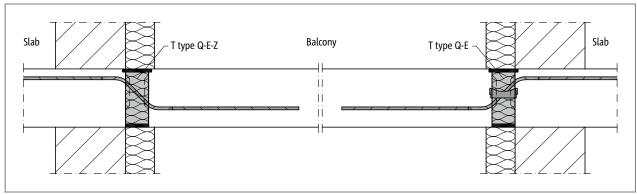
Schöck Isokorb® T type Q-E-Z, Q-E: Application case one-way reinforced concrete slab
